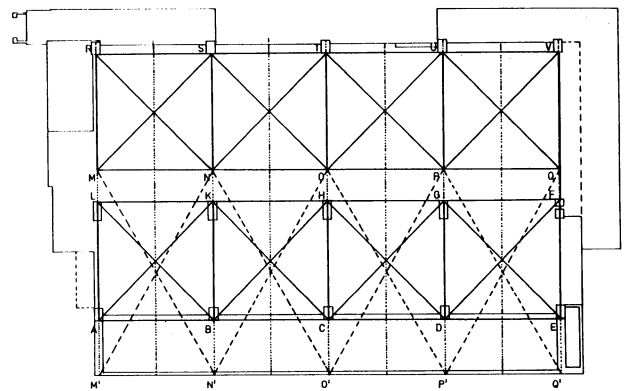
Schindler, Beach House, third-floor plan, proportional analysis (author).
